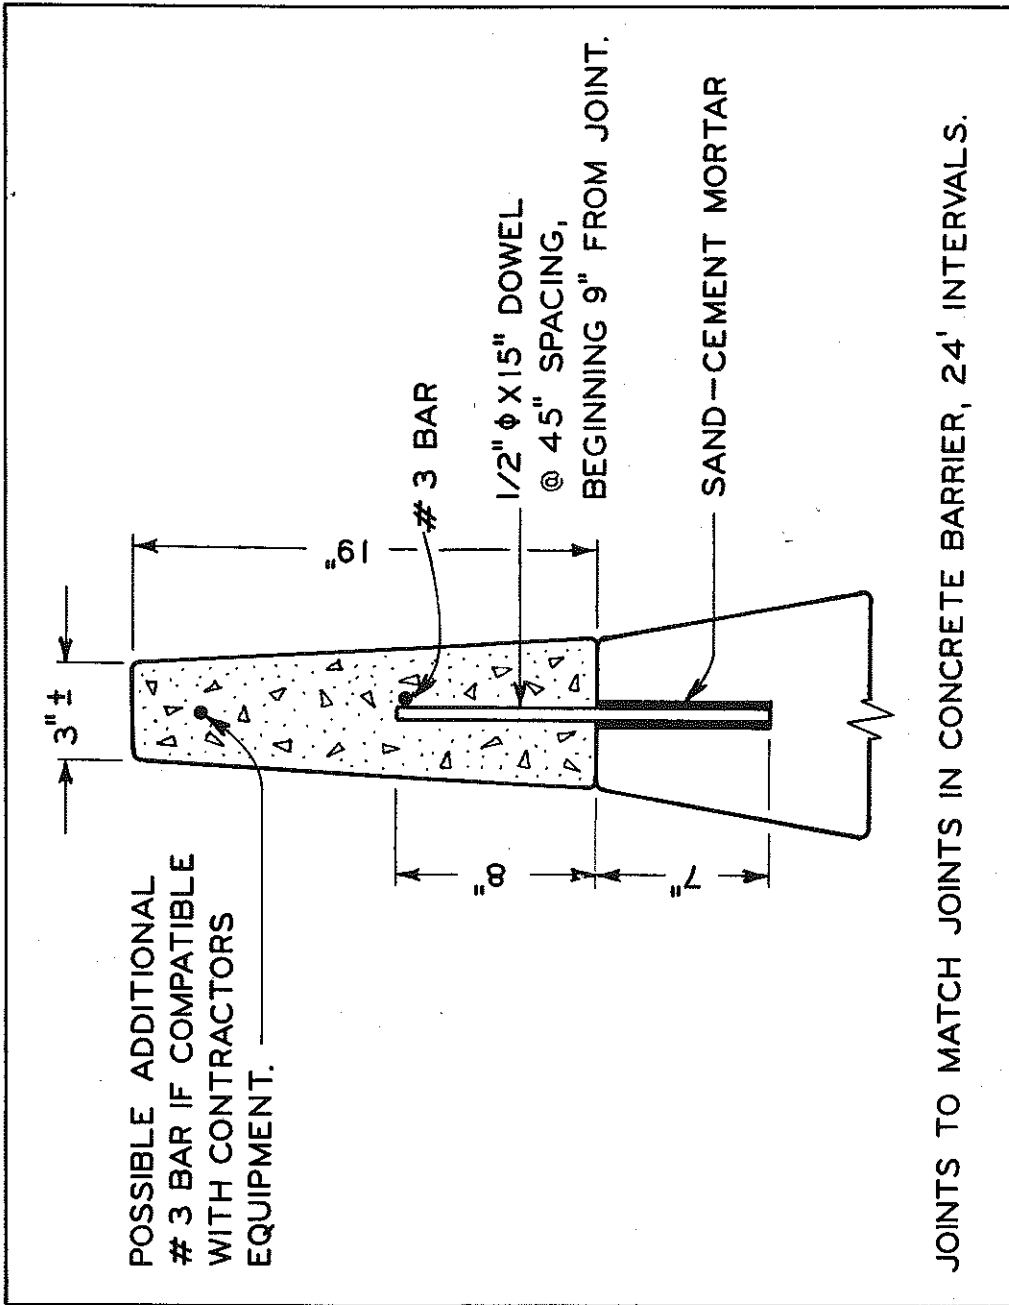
Proposed concrete glare screen to be placed on previously constructed concrete median barrier.
